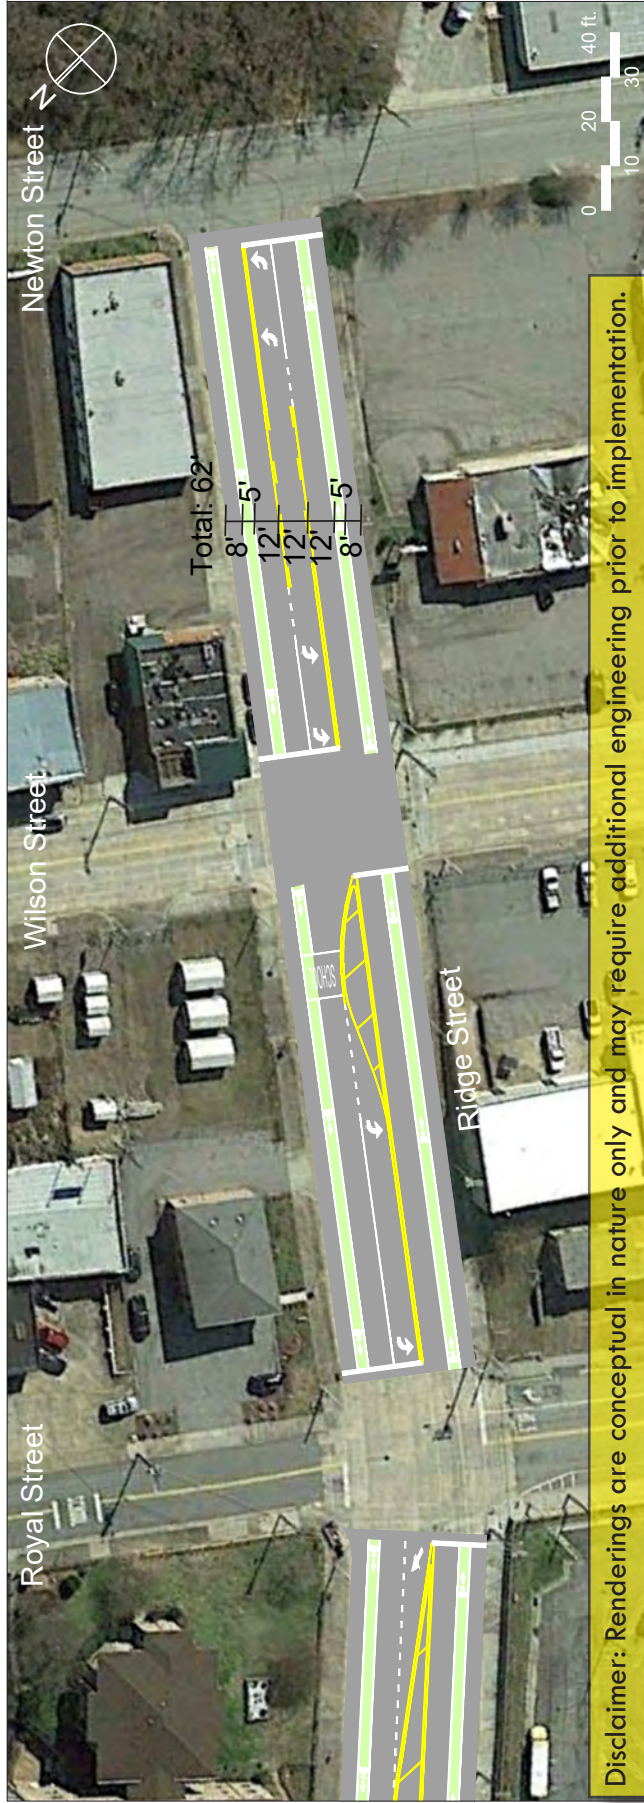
Ridge Street Road Diet Rendering (Page 3 of 4)
